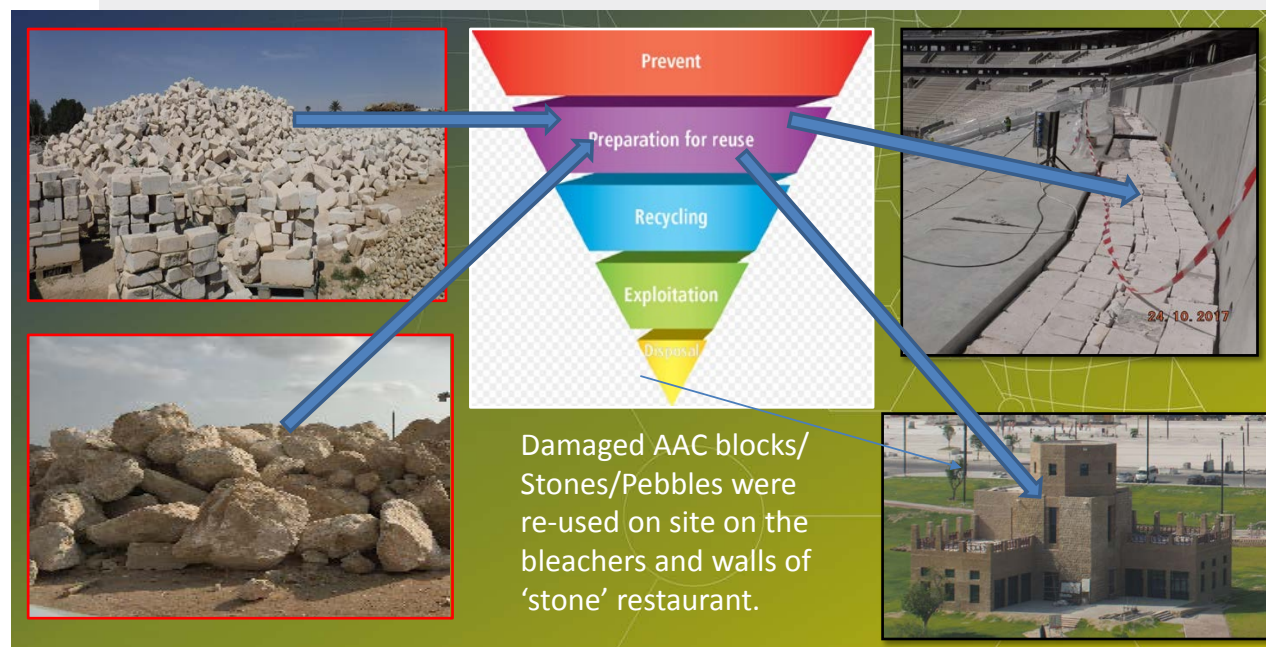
Reuse of damaged AAC blocks and stones at Al Bayt Stadium
